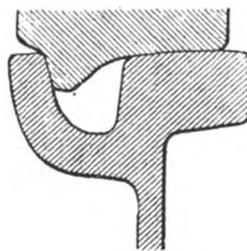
SHOWING WORN FLANGE BEARING AGAINST CHECK.
